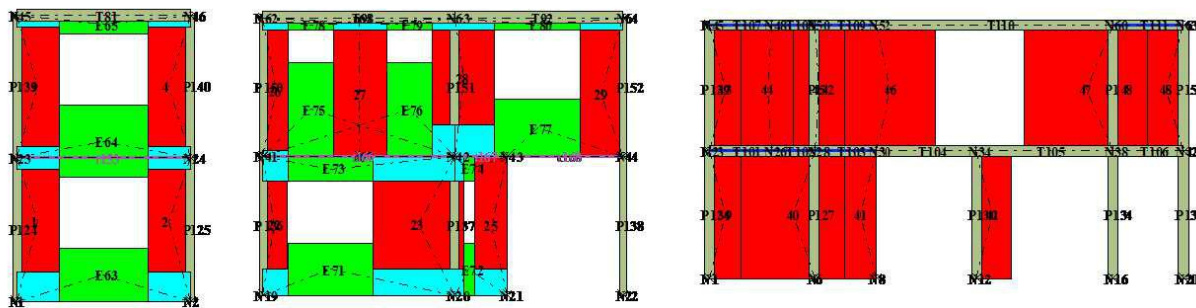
Example of walls using TREMURI for the proposed building (Fig. 5b): wall 1, wall 7 and wall 9 respectively.
